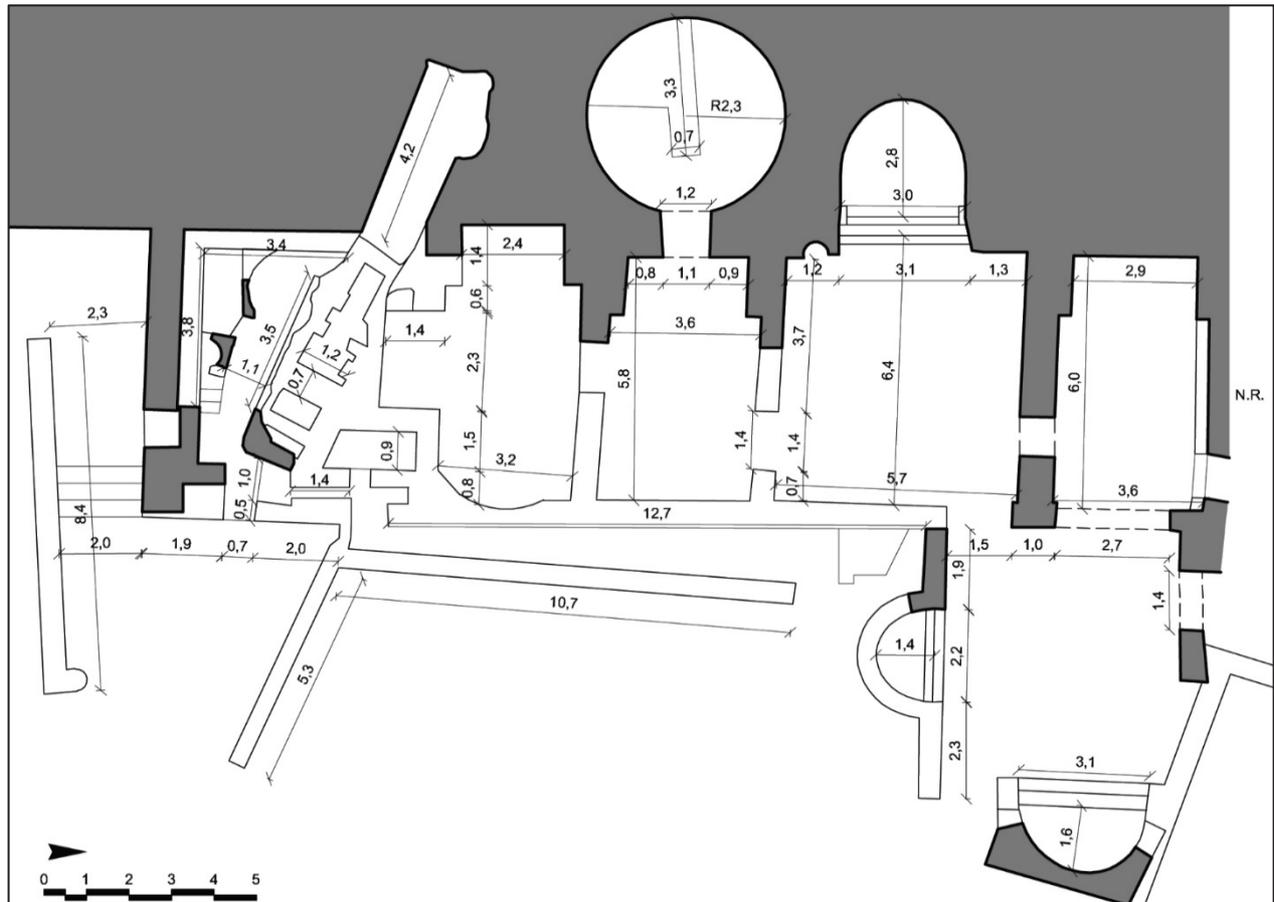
Architectonic plan with dimensions of Piccole Terme.
